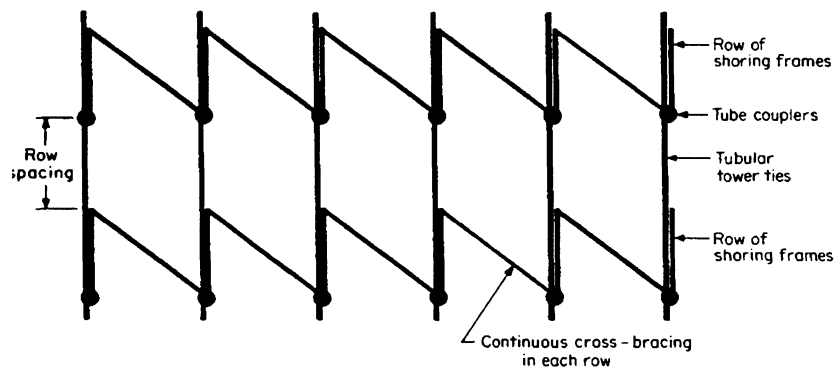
Lacing of shoring towers in one direction, continuous cross bracing in the other direction.
